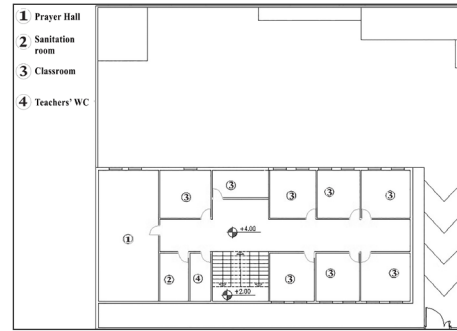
The Plan of the First Floor in Shahid Beheshti Primary School
